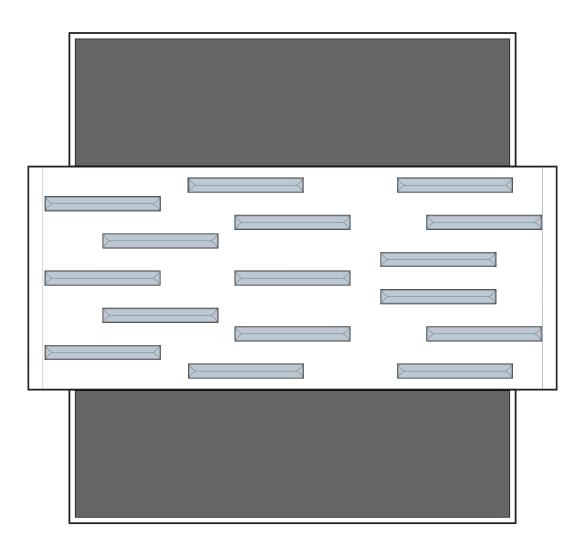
ROOF PLAN, SCALE 1:250.
